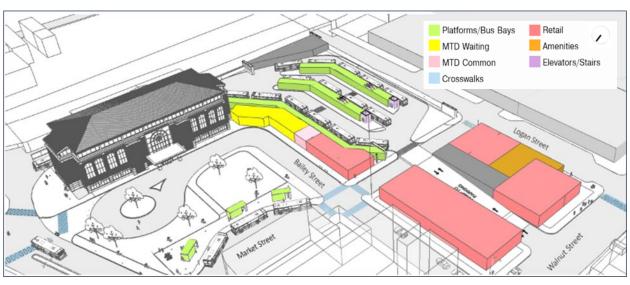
Site Layout for Second Floor of Illinois Terminal Expansion
